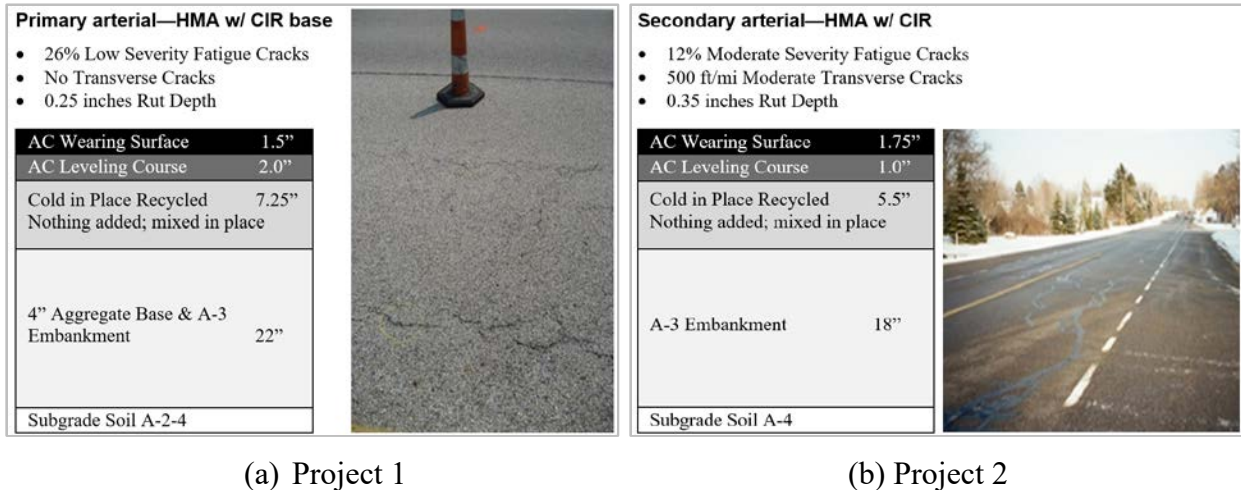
Example projects used to demonstrate characterization of existing flexible pavement.
